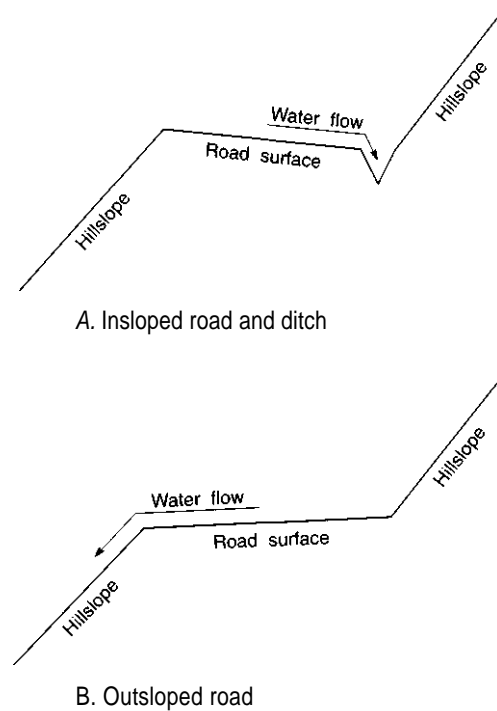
Logging road profiles showing (A) Insloped road with inboard ditch and (B) Outsloped road with no drainage ditch. Arrows show direction of flow of any water that would pond on the road surface if an adjacent culverted crossing became clogged. In A, the water is diverted down the inboard ditch; in B, the water traverses the road and flows back into the stream channel.
